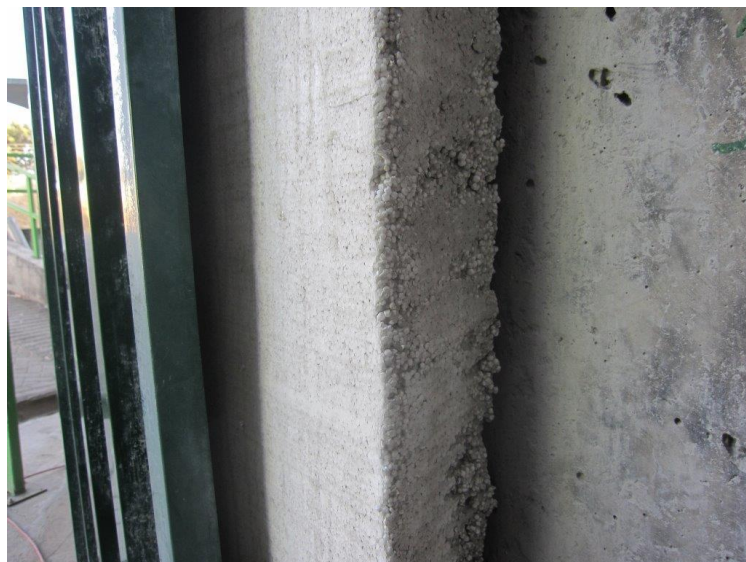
Section of digester wall showing concrete, insulation and cladding (Photo courtesy of Ms Angie Bywater)
